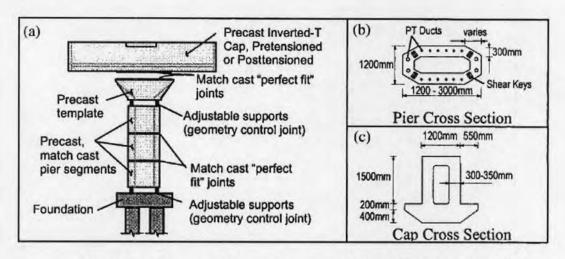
Elements of precast segmental pier (Billington et al, 1999)
